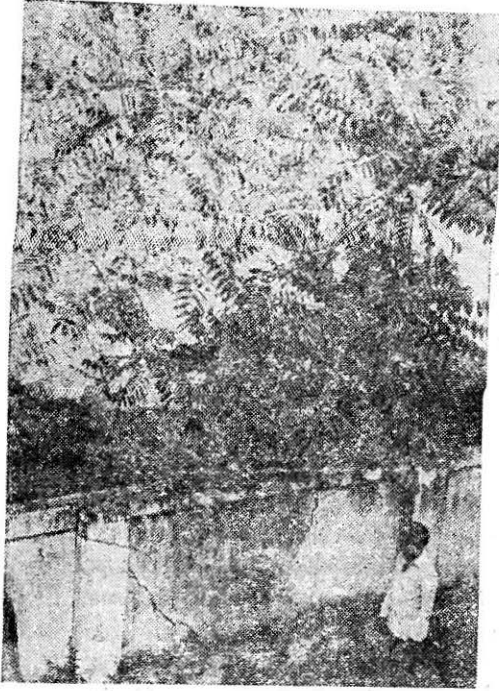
Cracking of Compound wall due to uplift pressure of roots in hard soil
